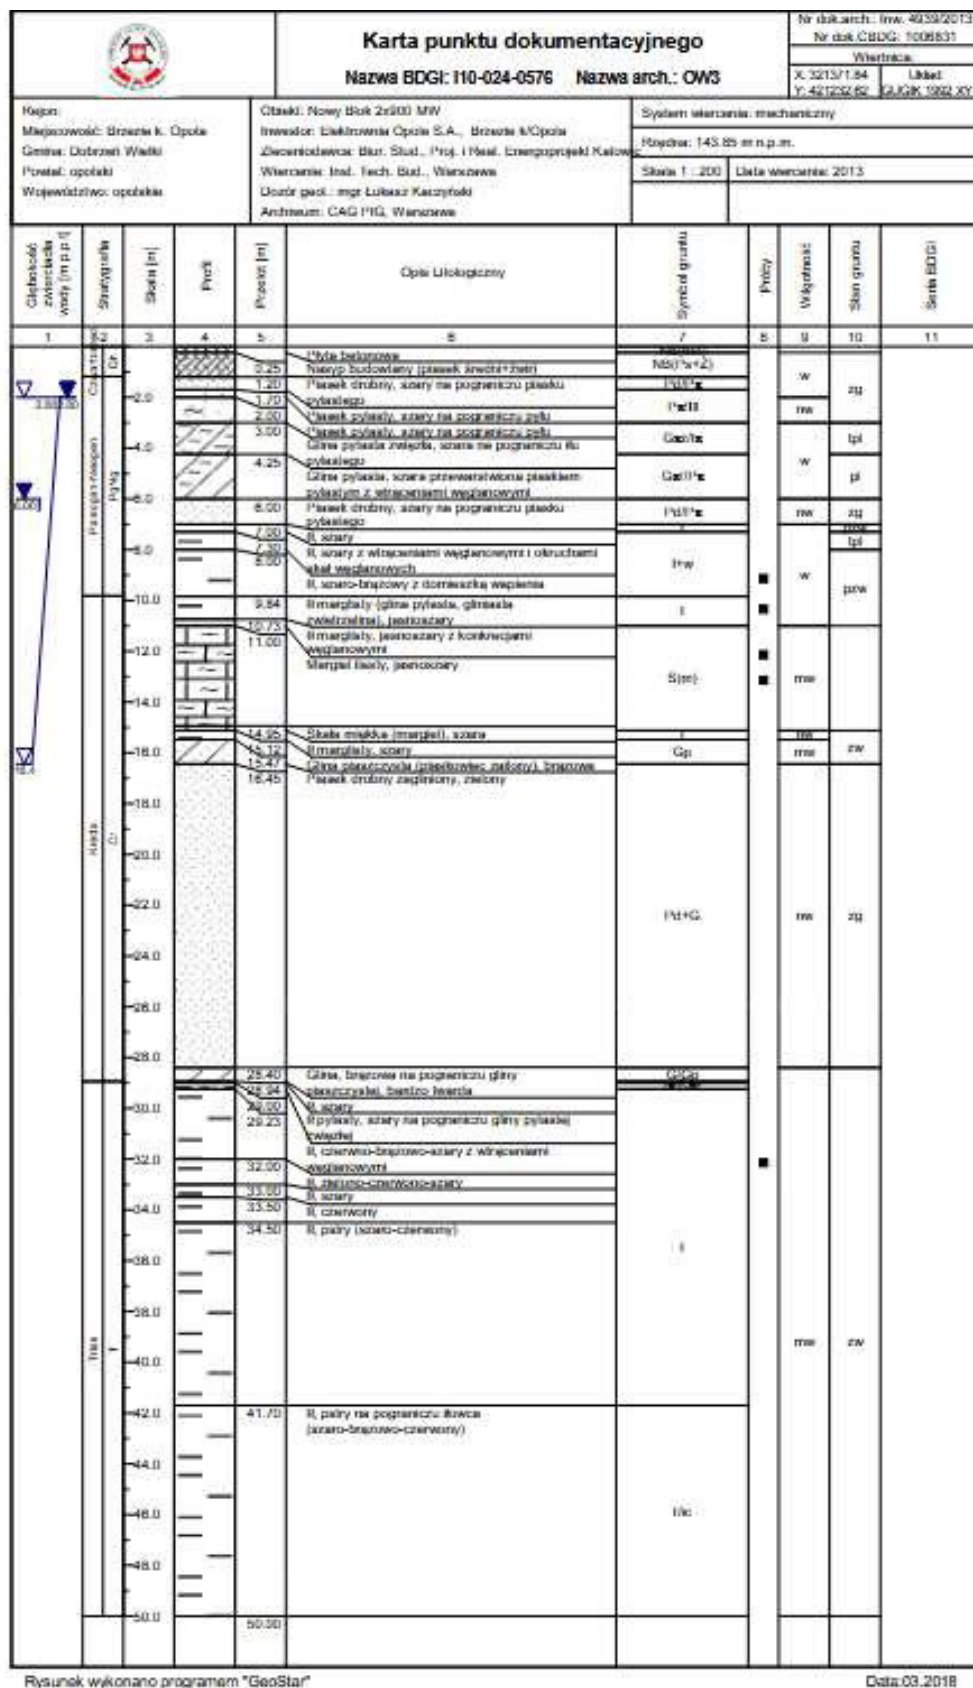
Sample ground test card in the area of existing buildings of the Opole Power Plant<sup>14</sup>
